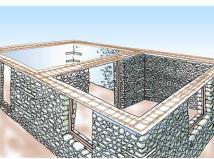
A: Seismic Strengthening Techniques: Stone Masonry Walls Strengthened with Wall Corner Stitches and Bands (bond beams)
